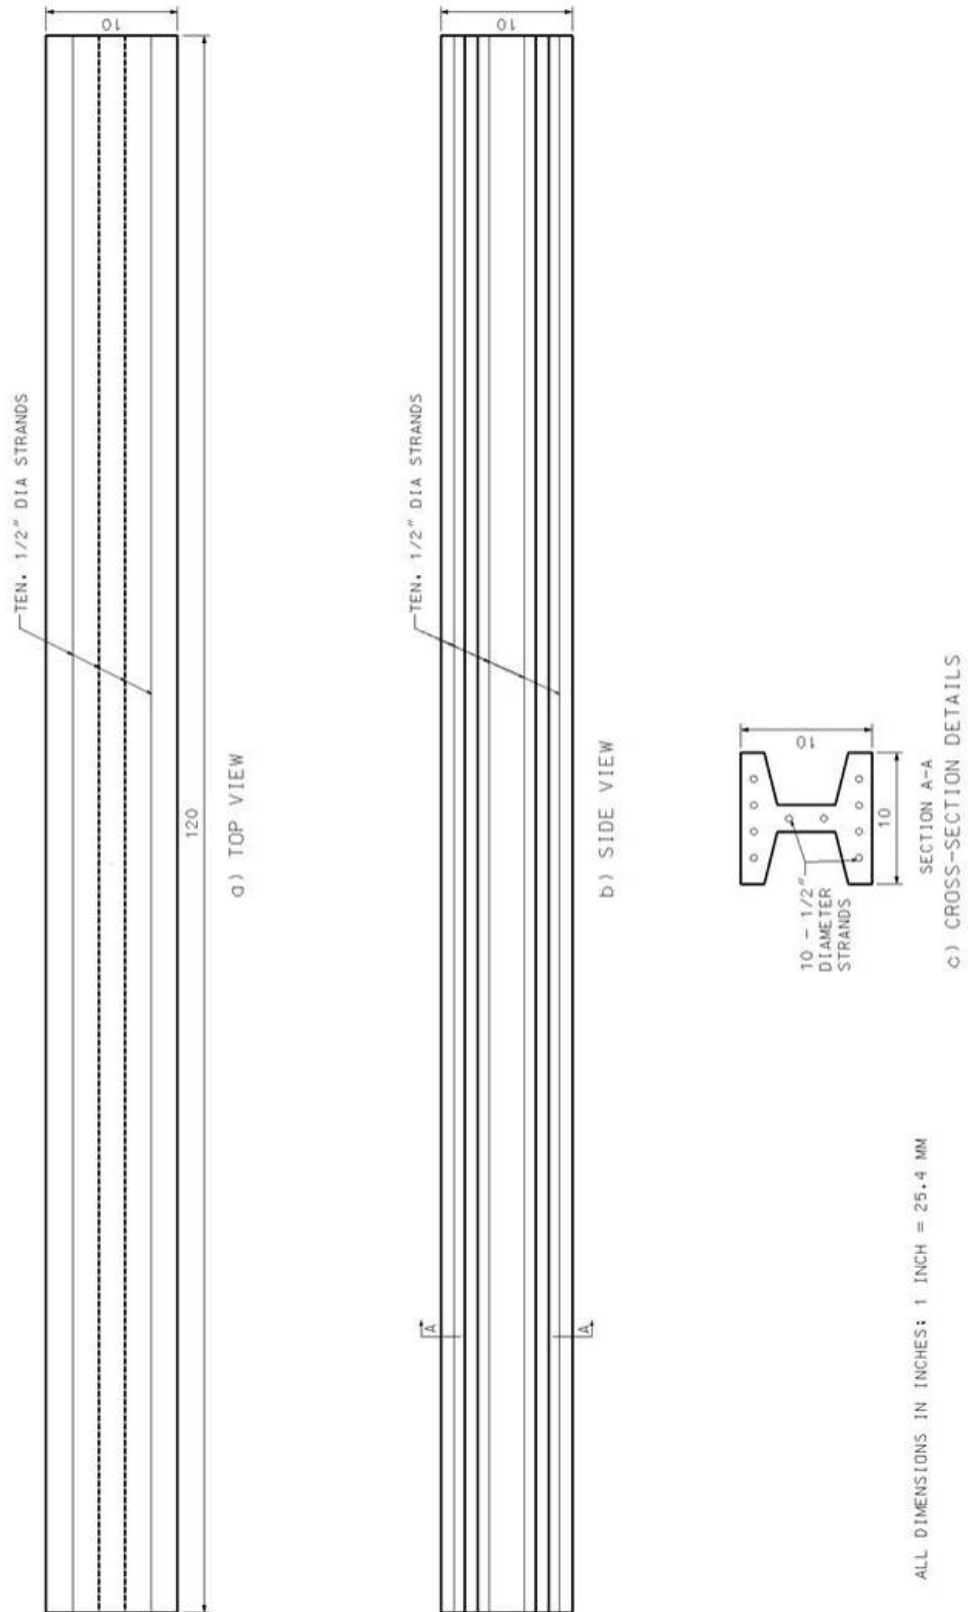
Dimensions and reinforcement details of the 10-ft (3.0-m) long UHPC pile units for laboratory tests
